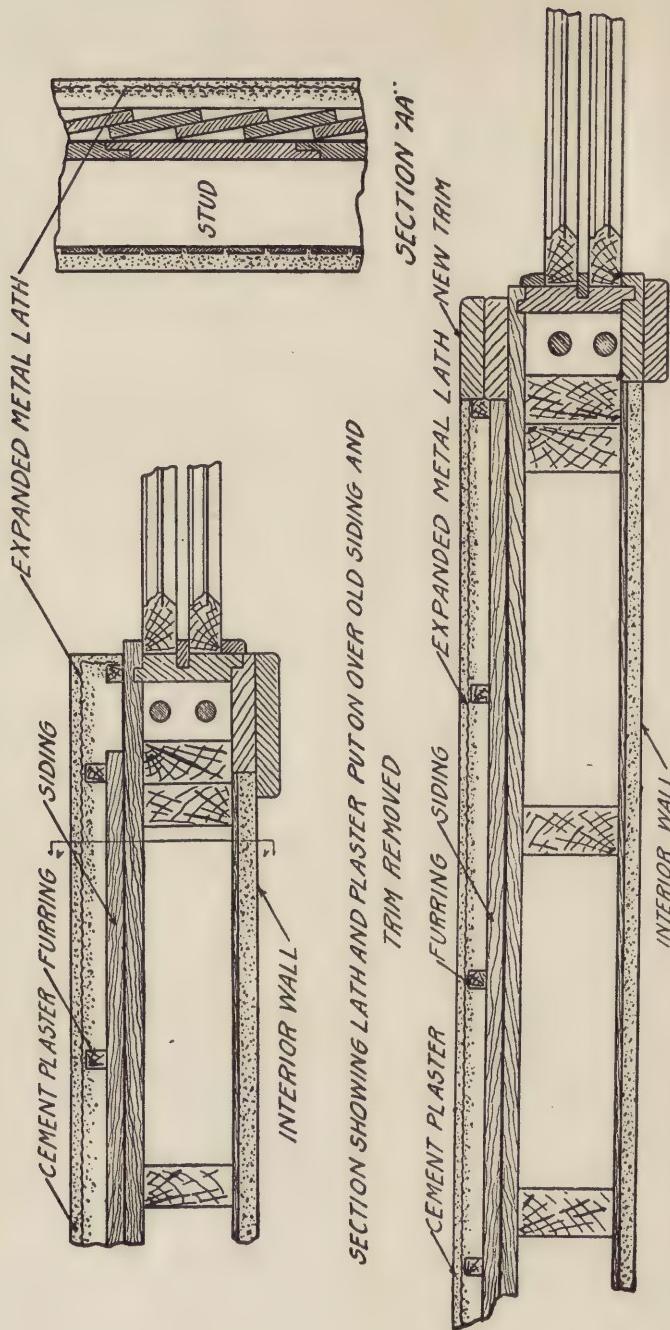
Typical Wall Sections—Cement Plaster “Overcoating.”
